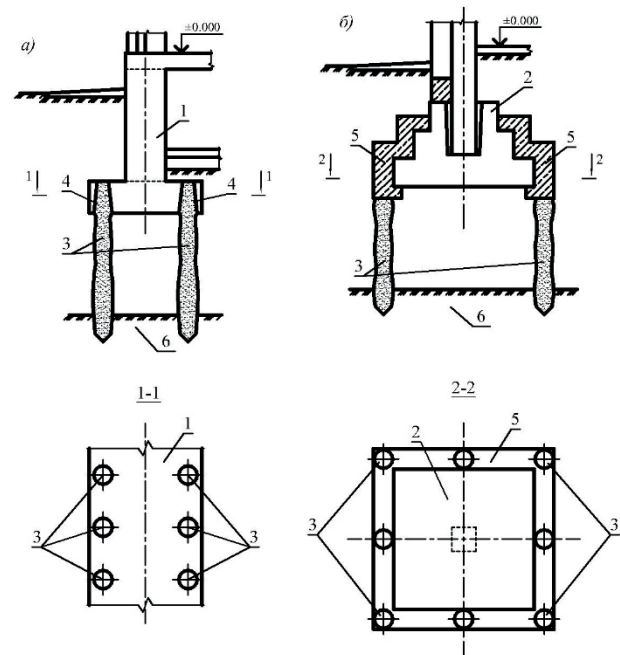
Foundations reinforced by injection (bored-injection) piles: a - under the bottom of the existing strip foundation; b - adjacent to the slab part of the existing separate foundation; 1 - existing strip foundation; 2 - existing separate foundation; 3 - injection (bored-injection) piles; 4 - cone hole in the slab part of the foundation; 5 - reinforced concrete cage; 6 - bearing layer of the foundation soil
